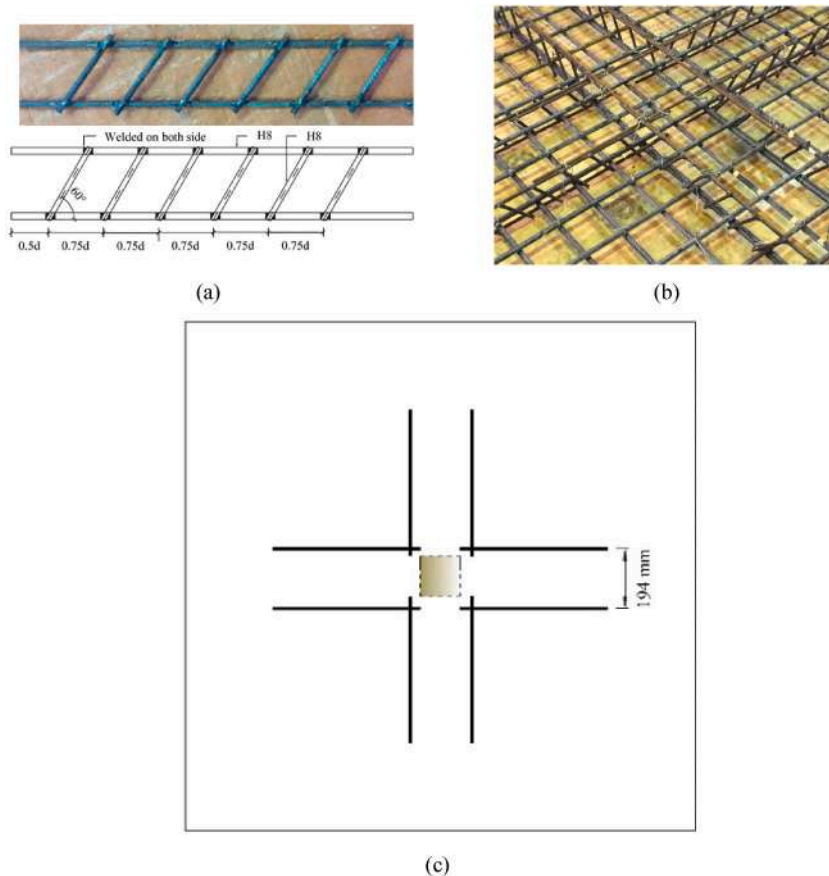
(a) WIB reinforcement details, (b) the elevation view of the WIB reinforcement as it was installed in the slab. (c) WIB reinforcement arrangement plan layout in slab S8.
